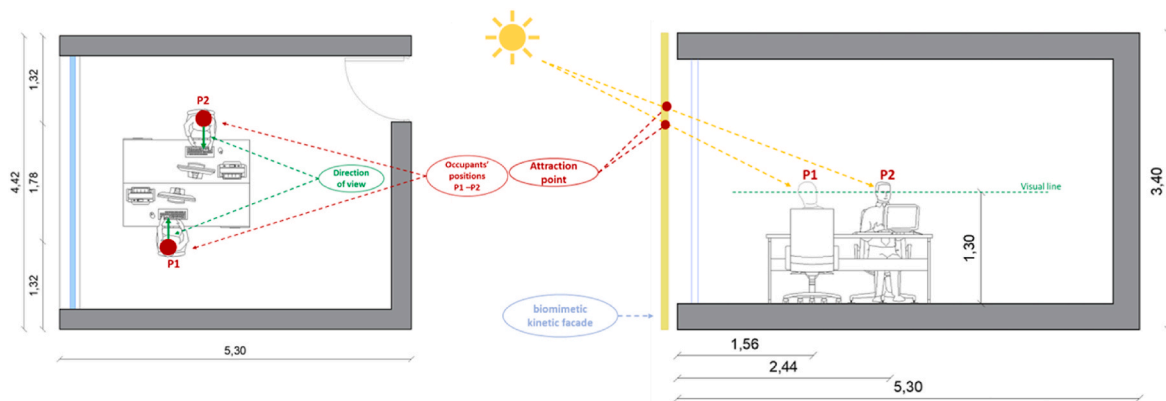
Test room as an office building with occupant positions, direction of view, and attraction point. Left: floor plan; right: section.
